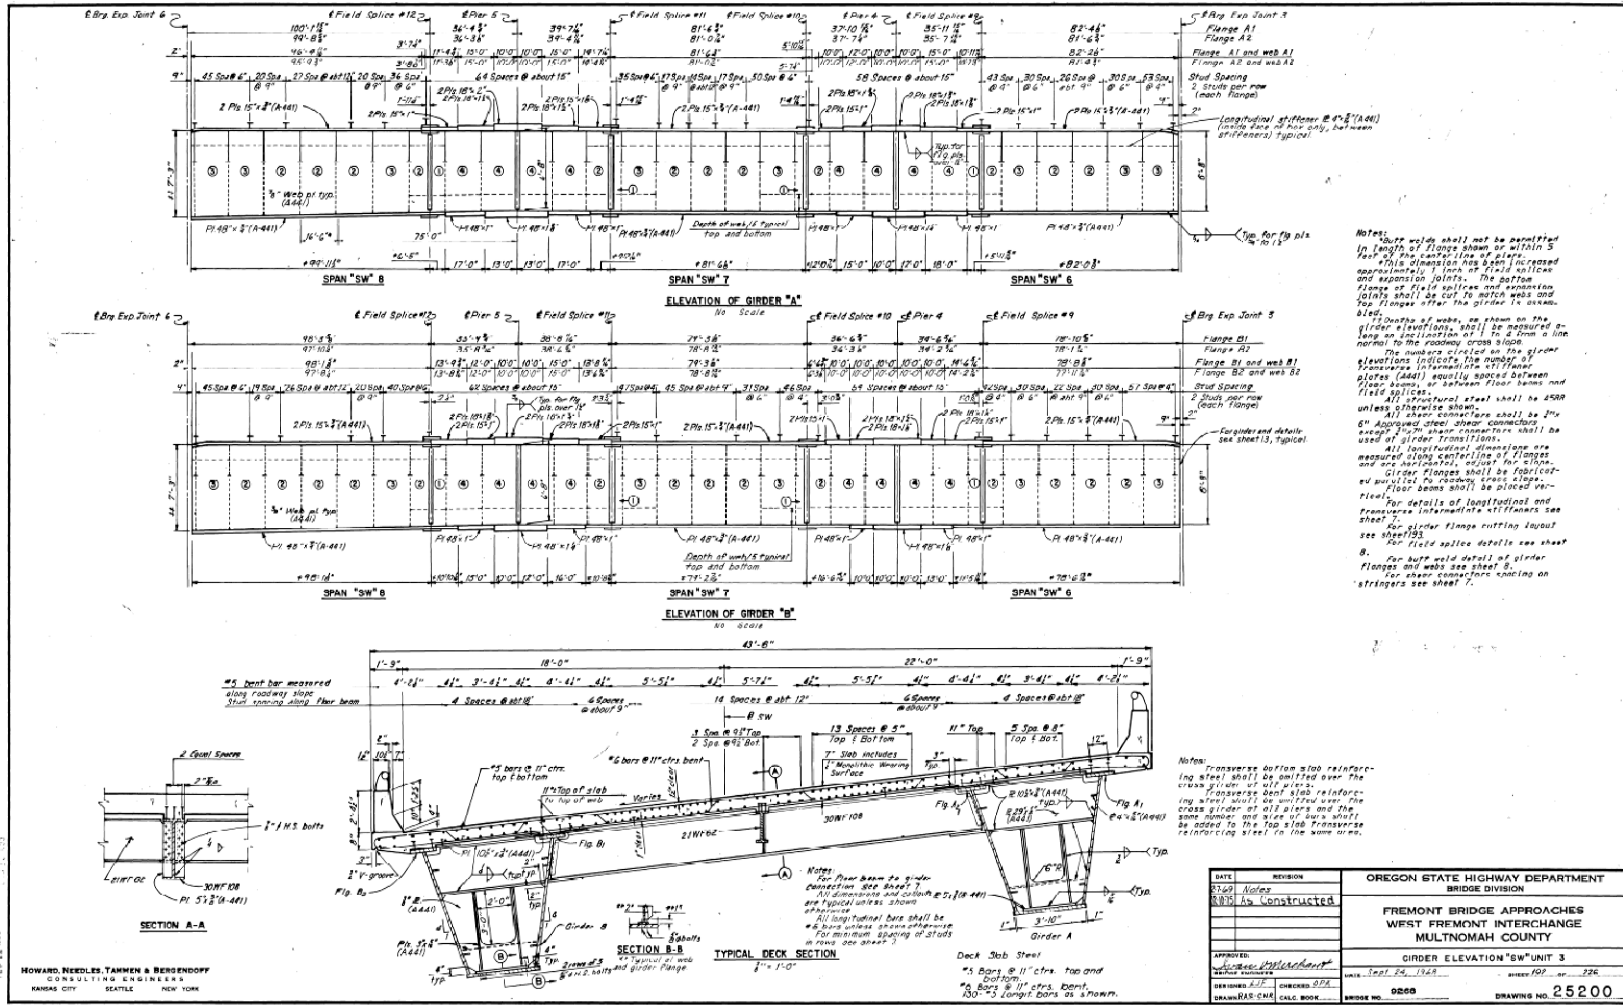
Structural details of SW Unit 3 Bridge superstructure 09268A.
